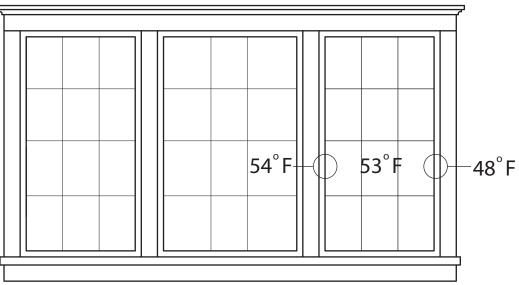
Shattuck Hall pre-retrofit, glazing is losing heat 4°F over the frame.
